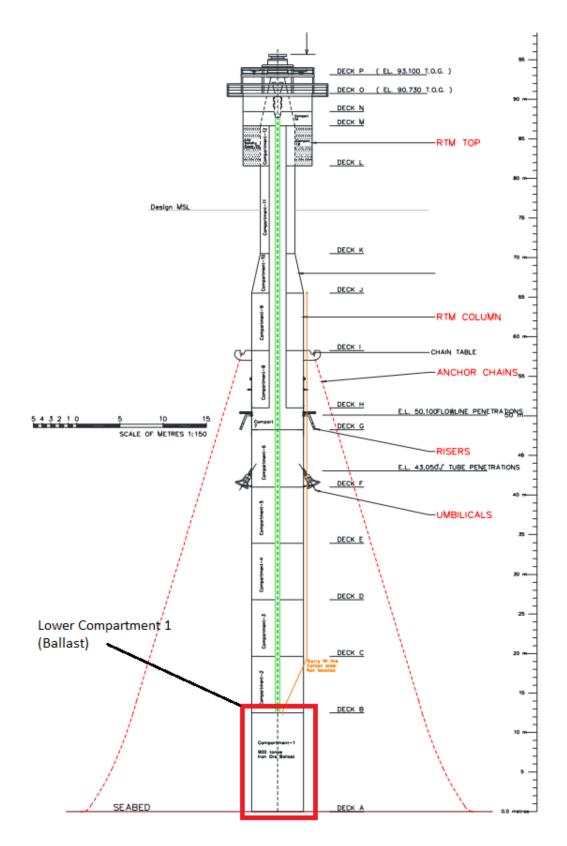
Griffin Riser Turret Mooring General Arrangement
